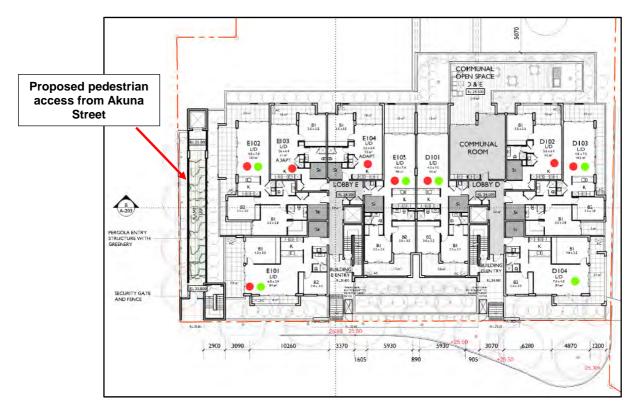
Extract Drawing A-106 showing location of new proposed pedestrian access from Akuna Street (courtesy ADM Architects).
